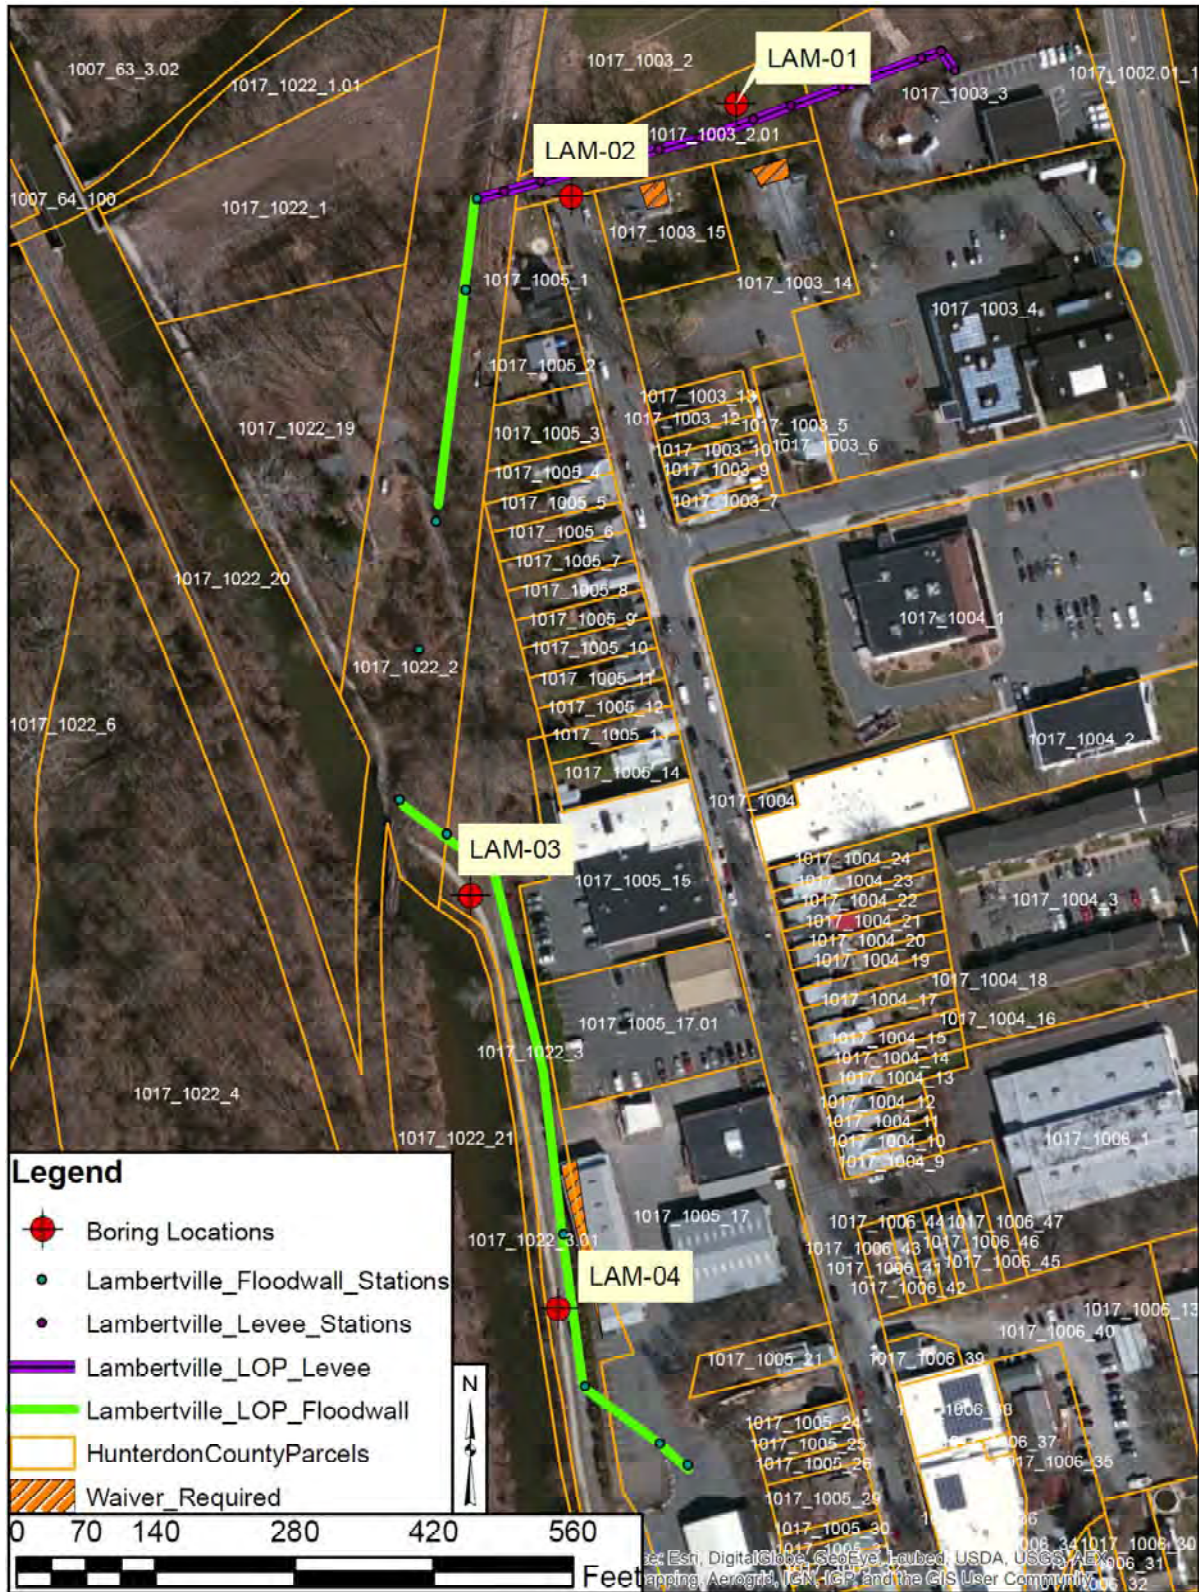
Geotechnical Subsurface Exploration, Lambertville, New Jersey – Test Boring Location Sketch
